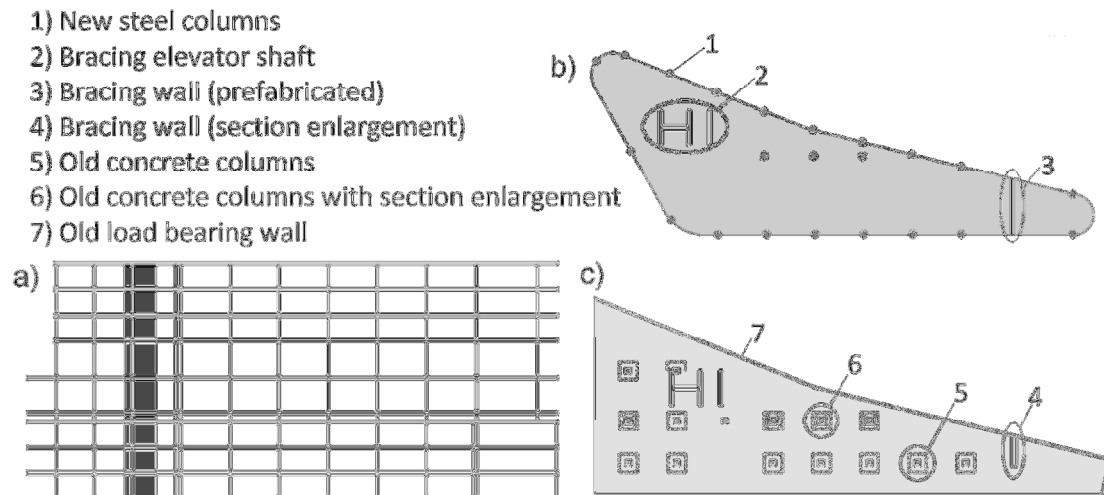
, Simplified illustration of Bonnier's Art Gallery; a) section, b) plan of new part and c) plan of old part.
